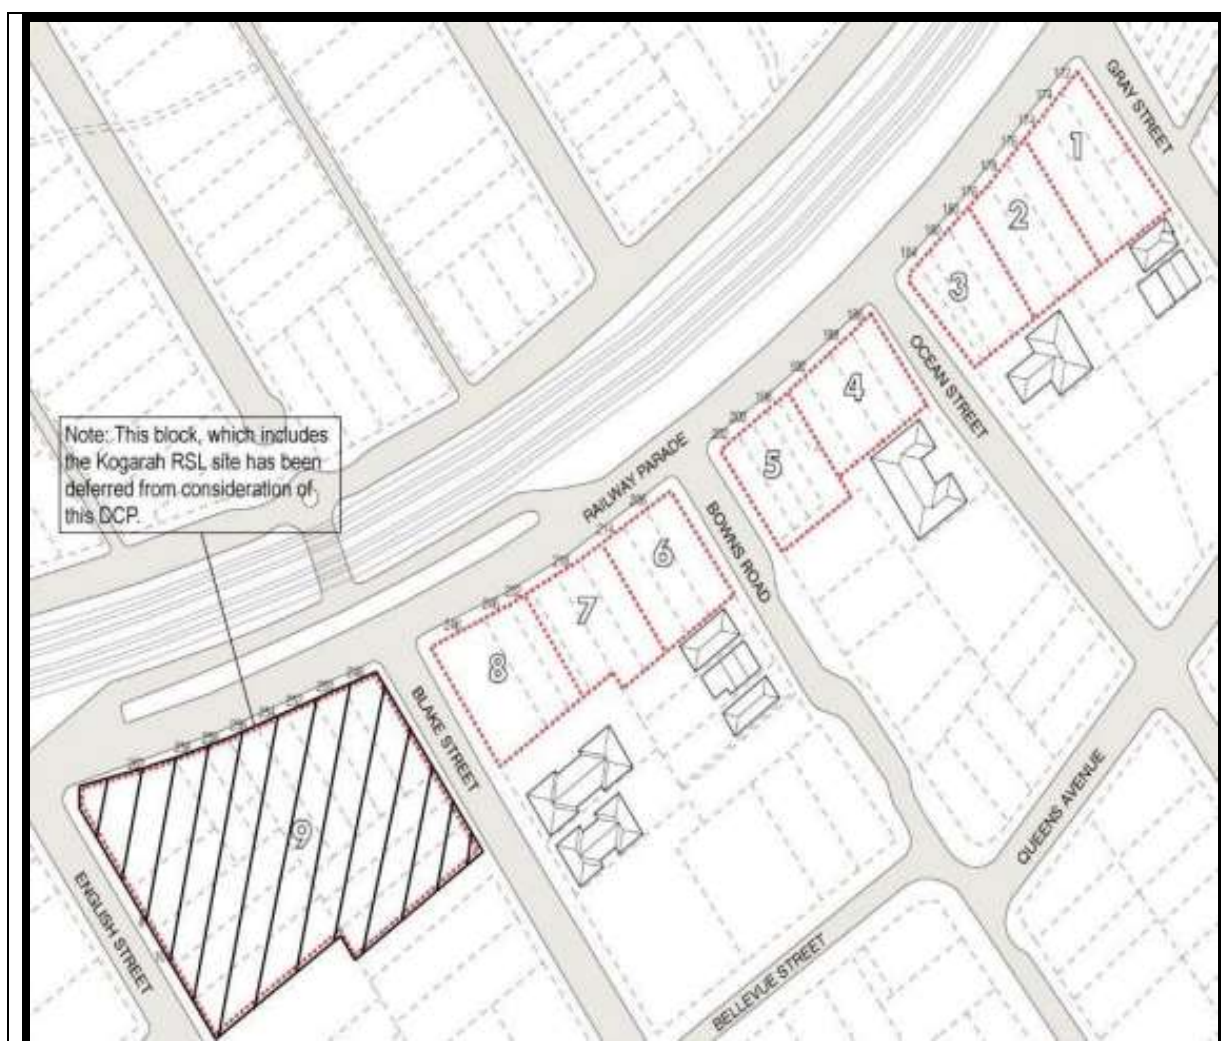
Site amalgamation along railway Parade. Subject site is shown as No 6.
